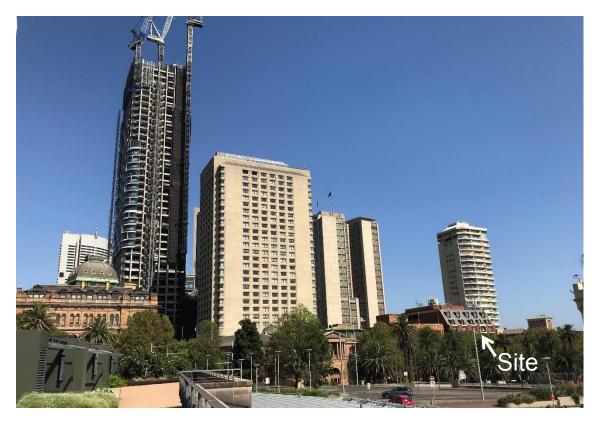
Development surrounding the subject site (including the AMP tower, the InterContinental hotel and The Quay) as viewed facing west from the Conservatorium of Music
